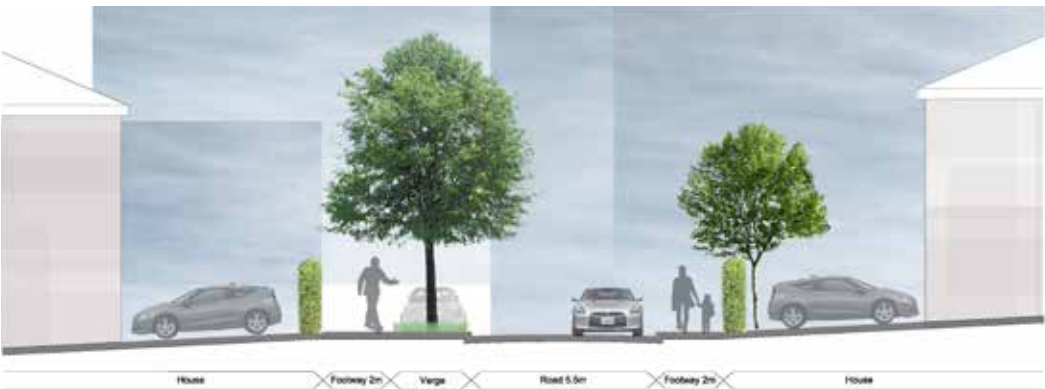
STREET SECTION, SECONDARY ROAD WITH ON STREET PARKING
